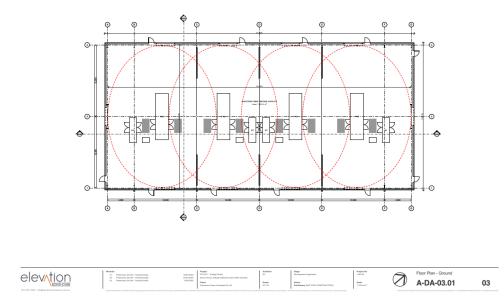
Proposed site Layout including Gladstone Testing Factory
